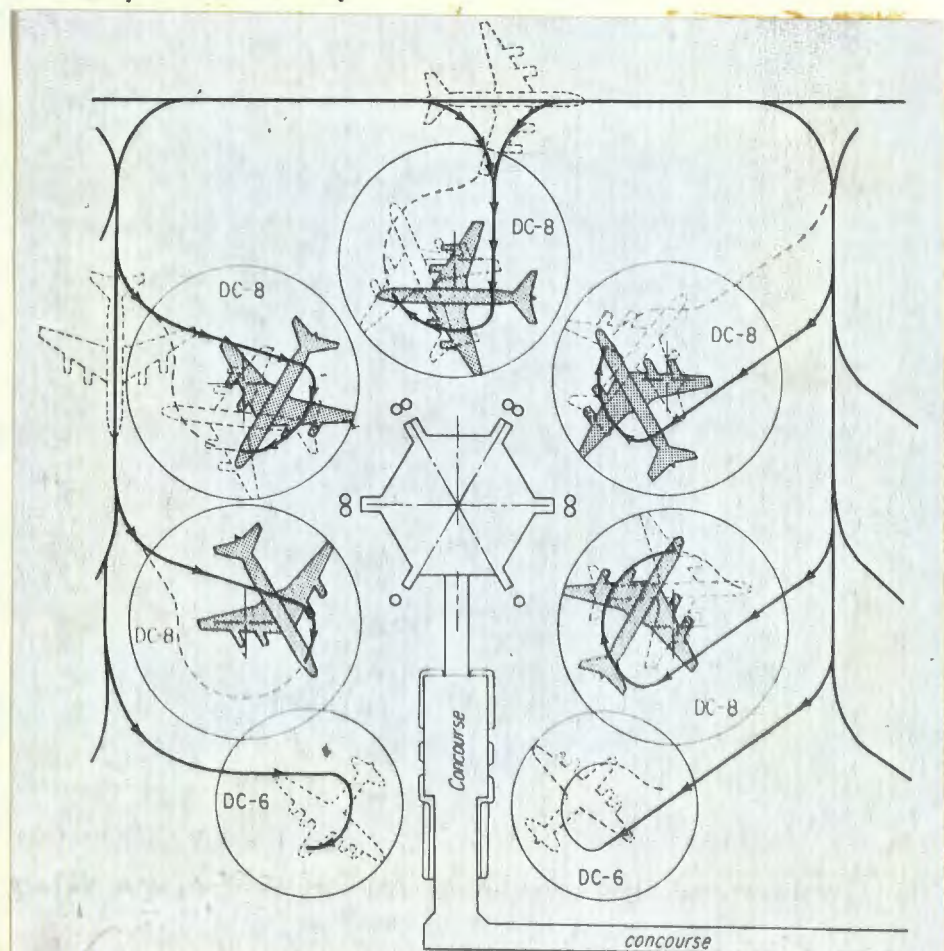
Aircraft Parking Positions around Pier Finger
